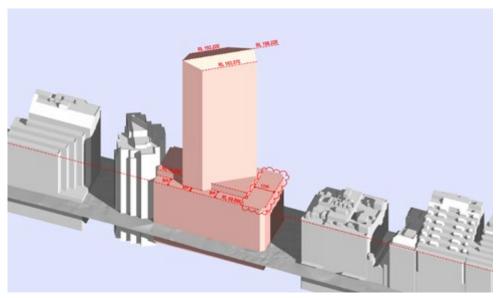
Approved maximum building envelope for 201 Elizabeth Street, viewed from east, illustrating angled tower to minimise overshadowing
